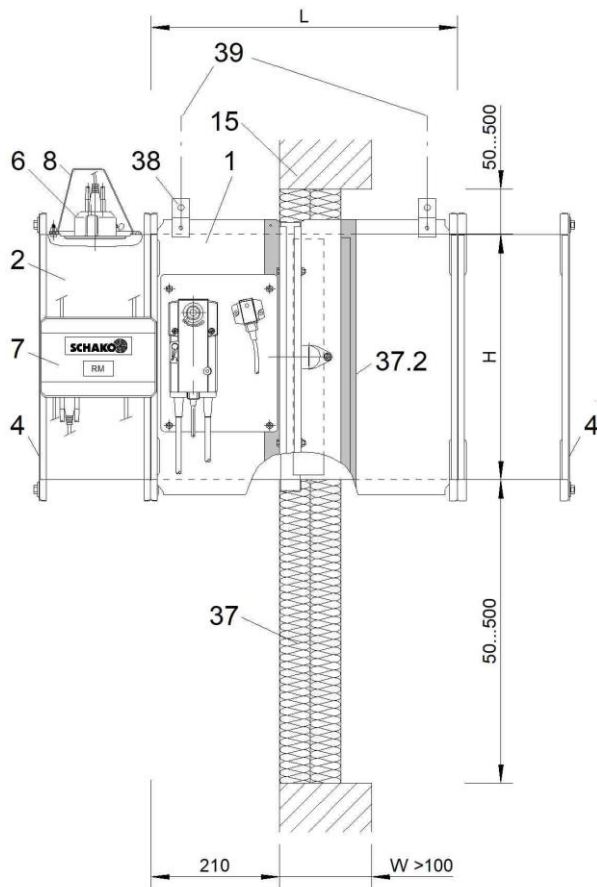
Installation in solid wall (wall thickness > 100 mm)
